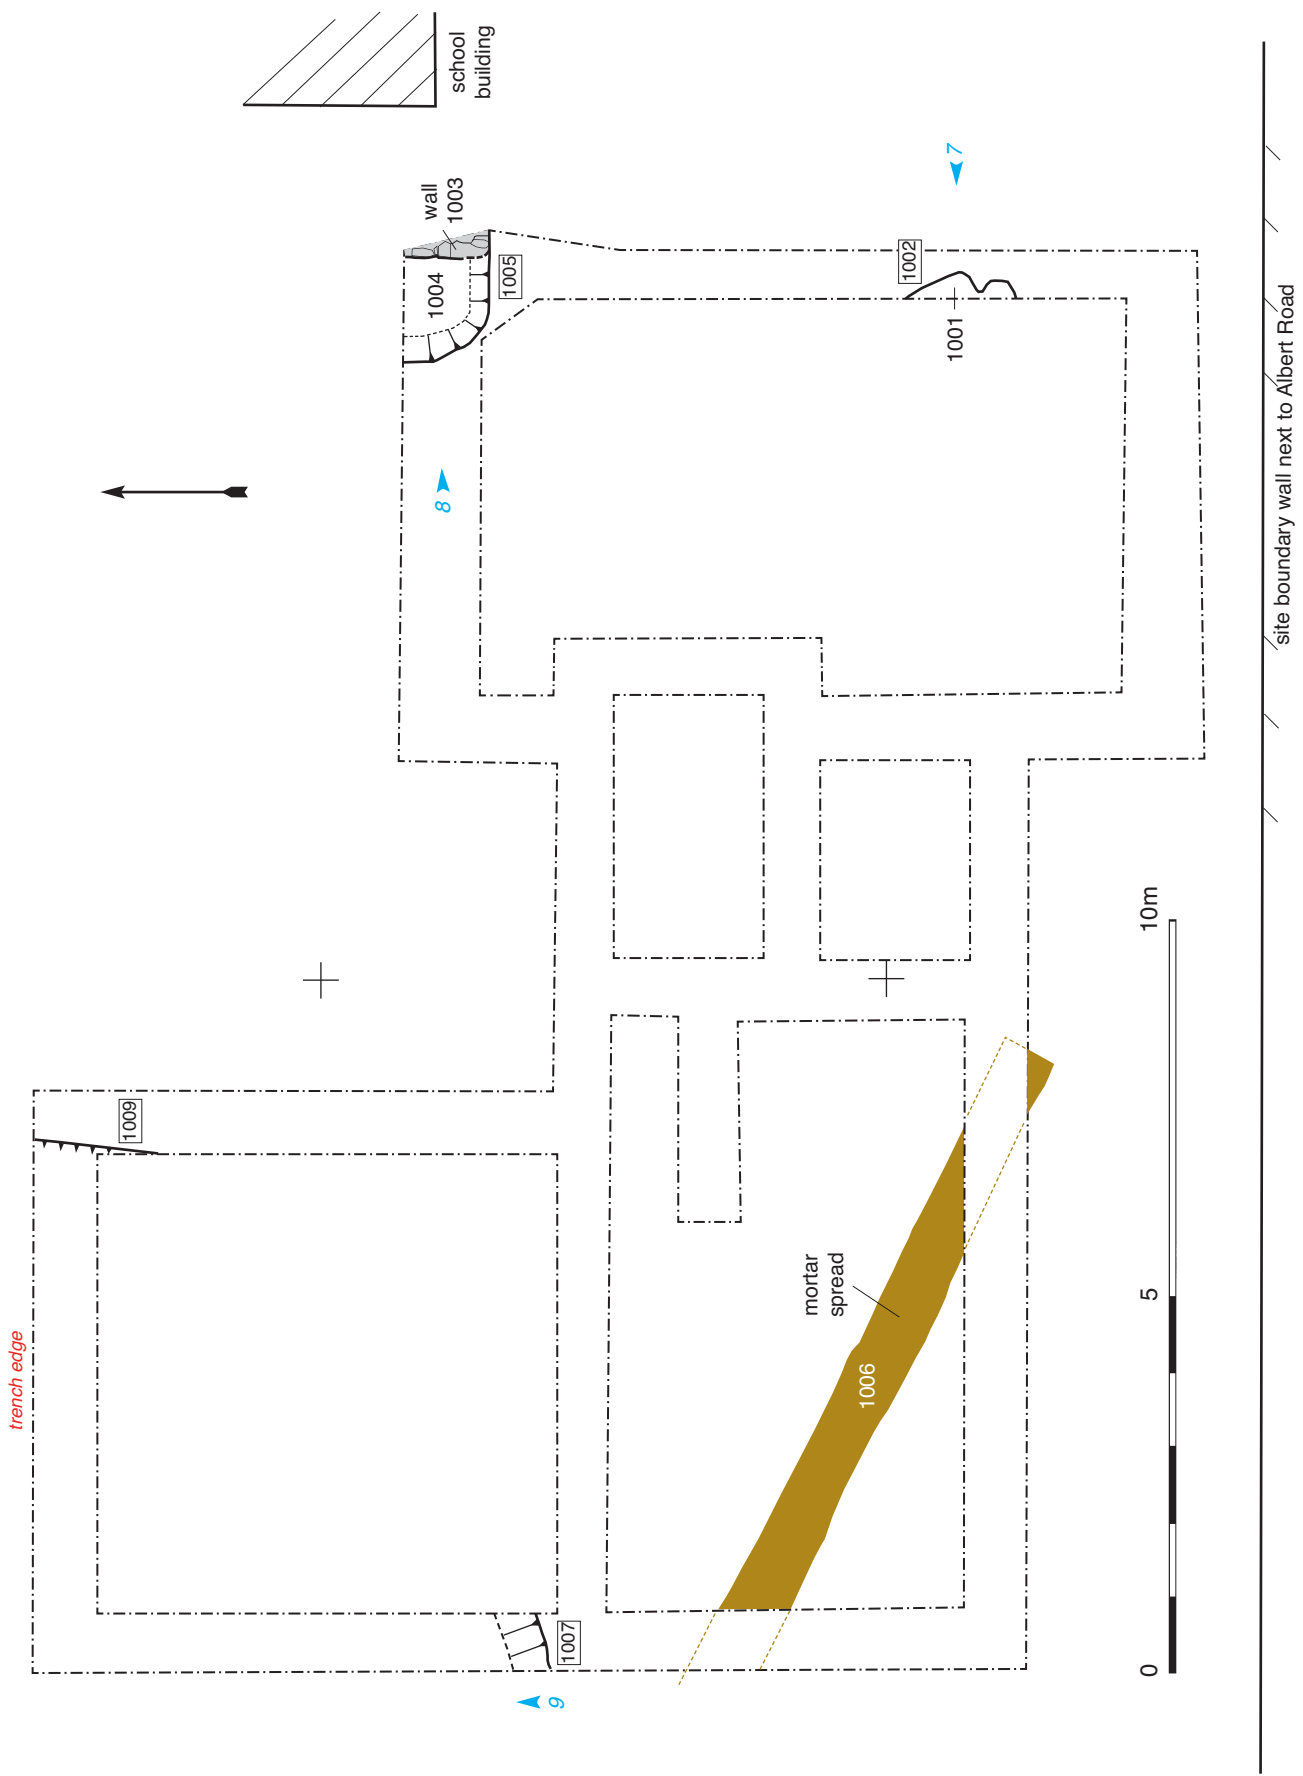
Plan showing outline of foundation trenches and location of recorded archaeological features, scale 1:100
